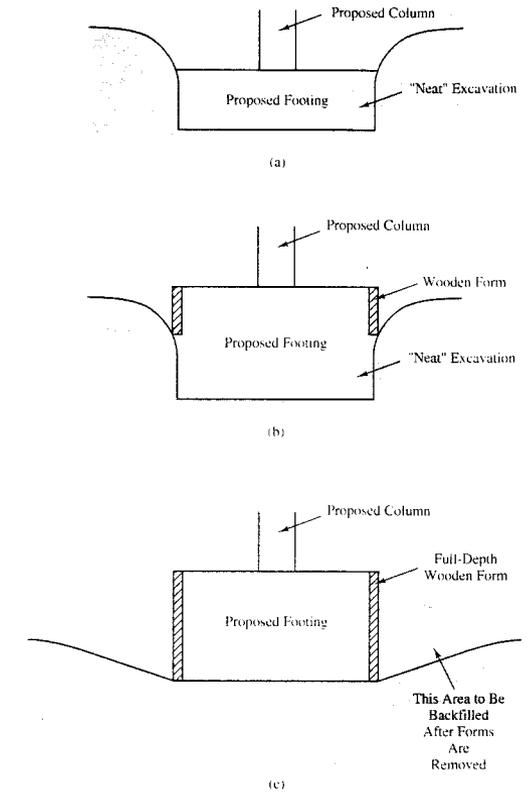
Methods of placing concrete in footings: (a) Neat excavation. (b) Neat excavation with wooden forms at the top. (c) Formed footing with full-depth wooden forms.
